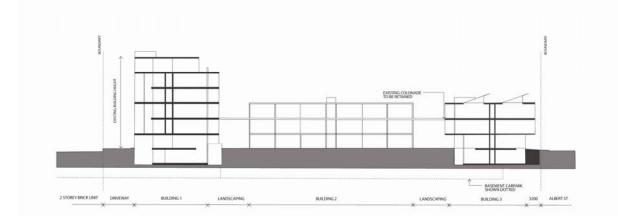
Section drawing through Buildings 1, 2 and 3 of approved concept plan
